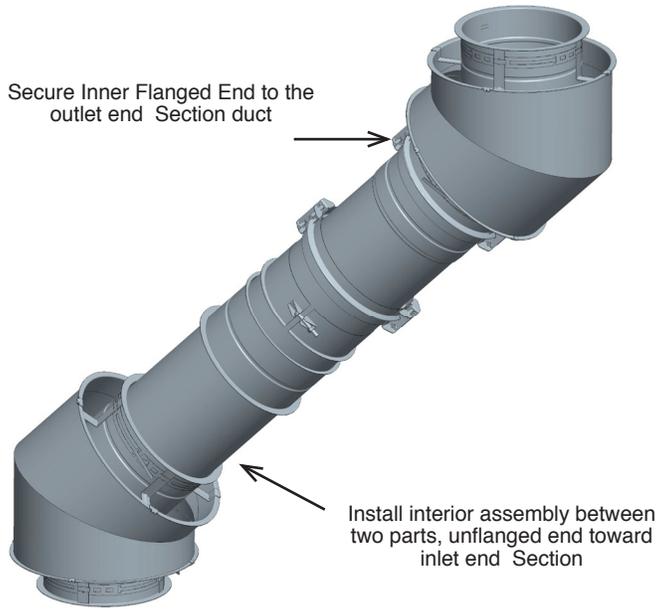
Step 5-6 - Install the inner LV and secure the outlet end Flange
